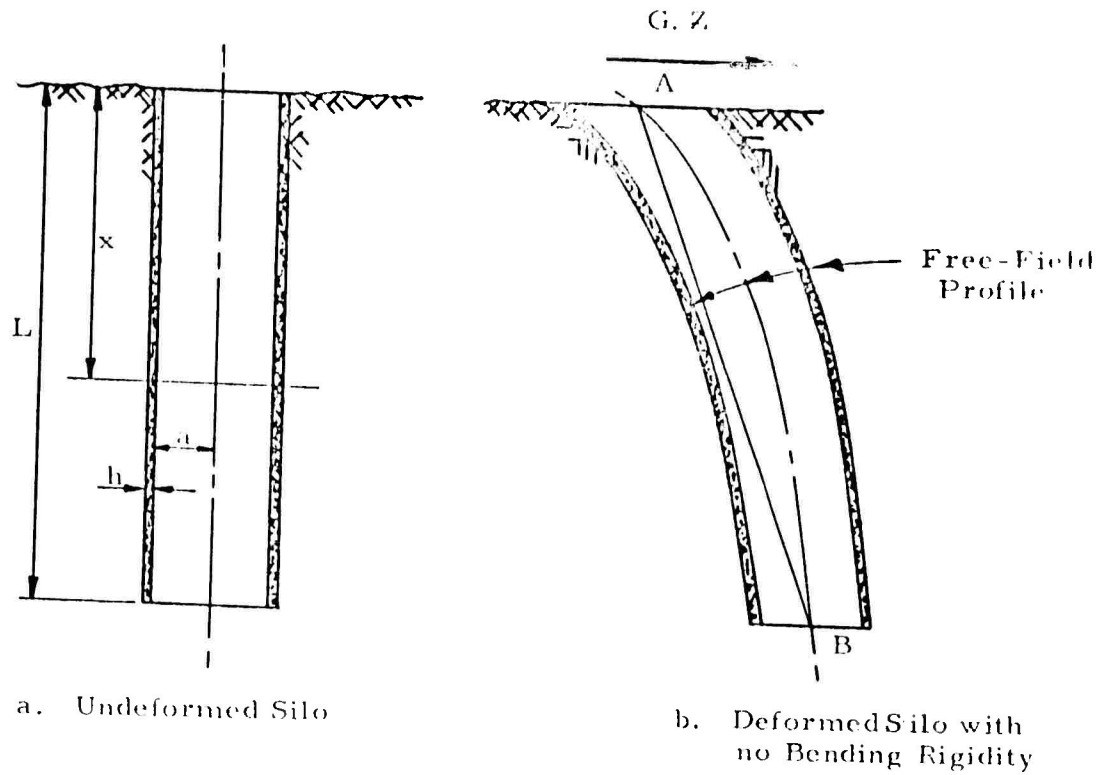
SECTIONAL ELEVATIONS OF SILO LINING
